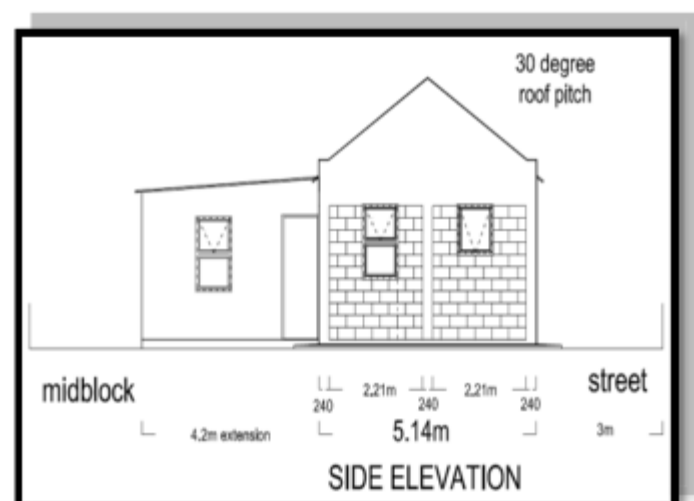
TYPOLOGY A - SIDE ELEVATION
